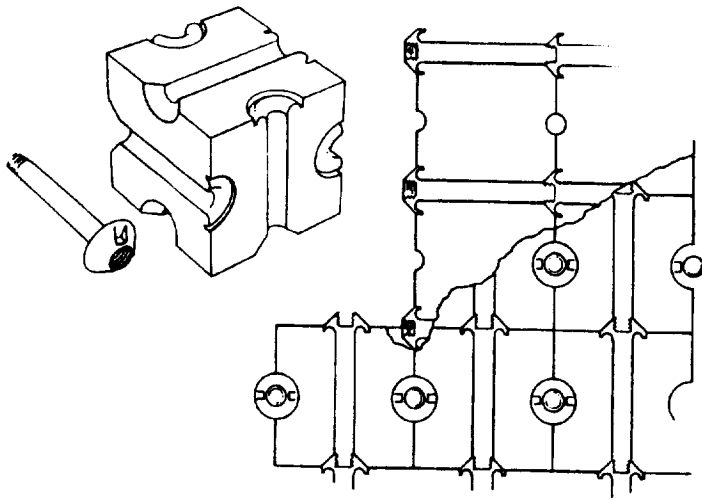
Resistance welded wire nails passing through the blocks
